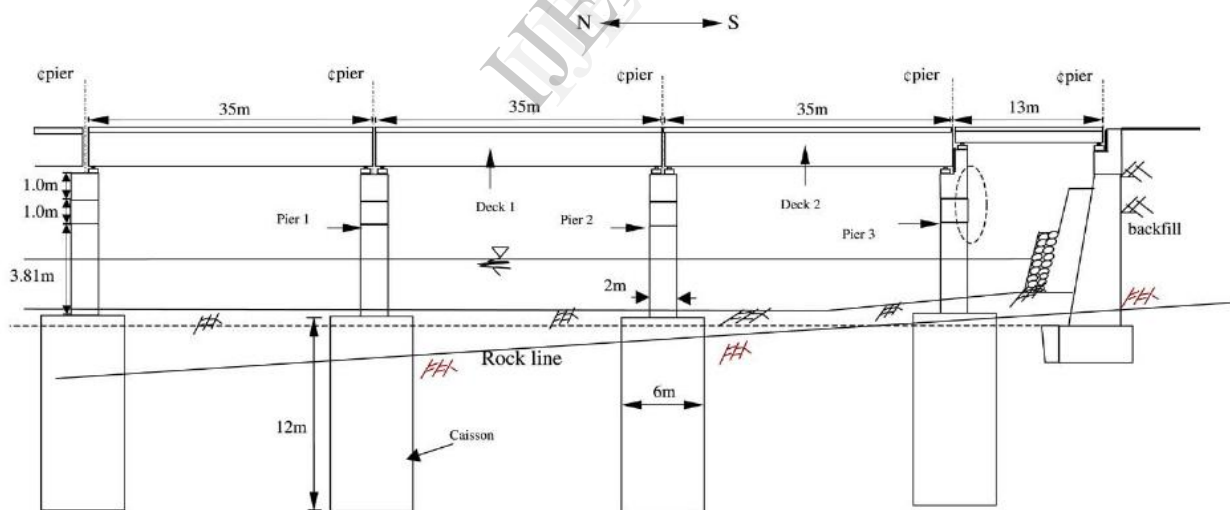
Elevation view of 4 segments at south end; the bridge has 13 segments in total: 13 m + 11@35 m + 13 m.
